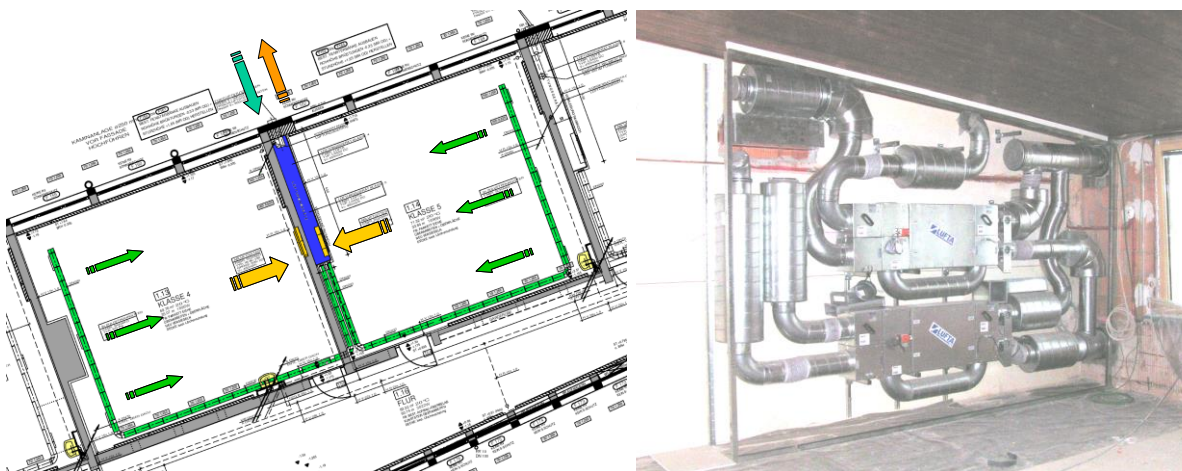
Decentralised ventilation concept for the overall modernisation of a primary school in Baiersdorf. Two ventilation units for two classrooms next to each other are installed behind a drywall installation.
